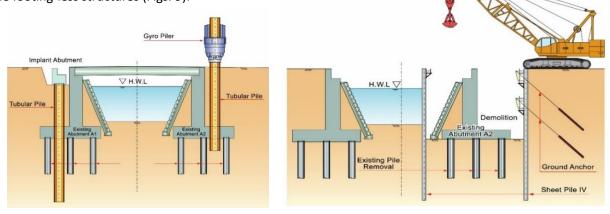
Installation of Strut-free Piles for Construction of Robust Structure through Obstacles
